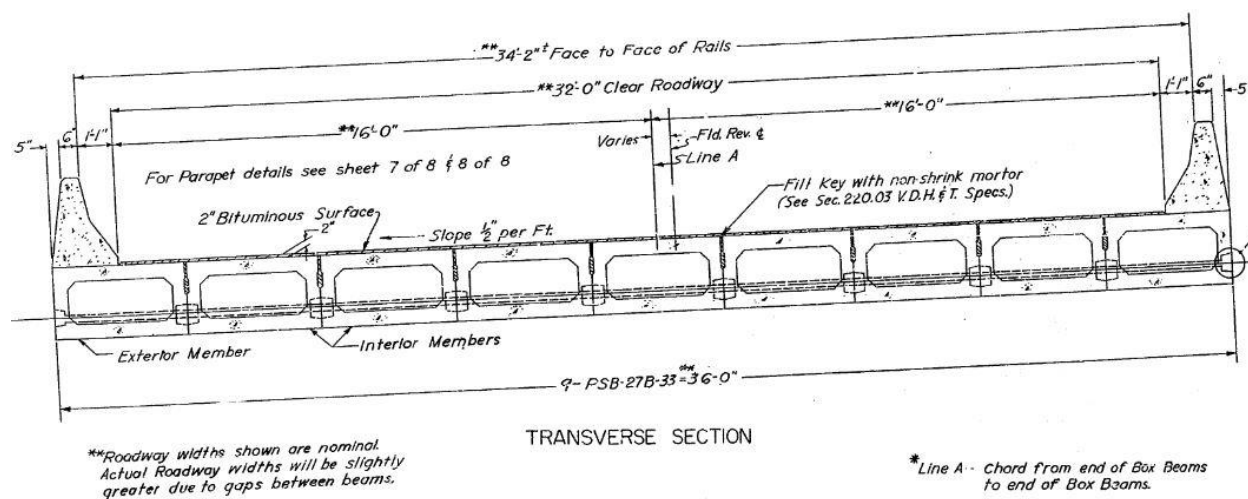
Transverse View of Buffalo Branch Bridge Plans
